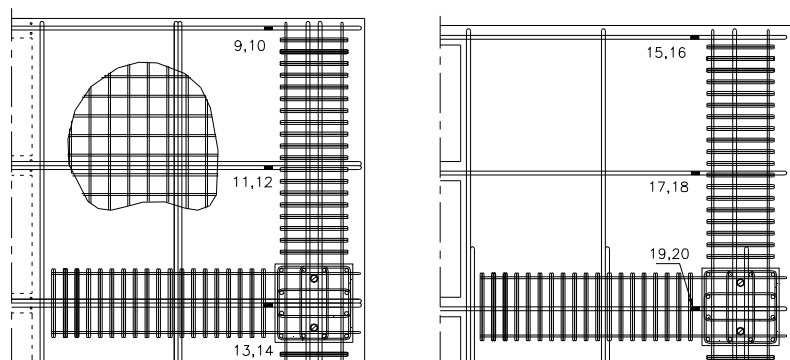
Location of strain gauges: a) upper longitudinal reinforcement, b) bottom longitudinal reinforcement
